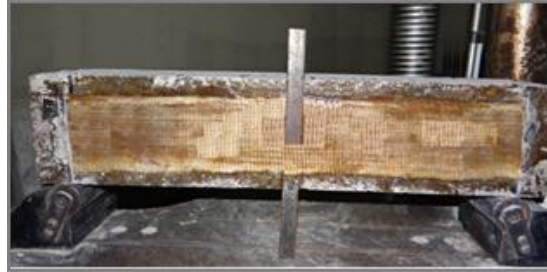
GFRP layout fixed at the bottom soffit of beam.
